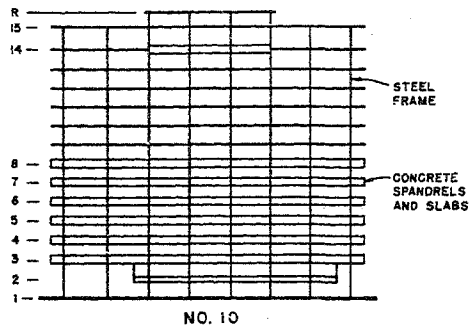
VIEW OF BUILDING CONSTRUCTION.
